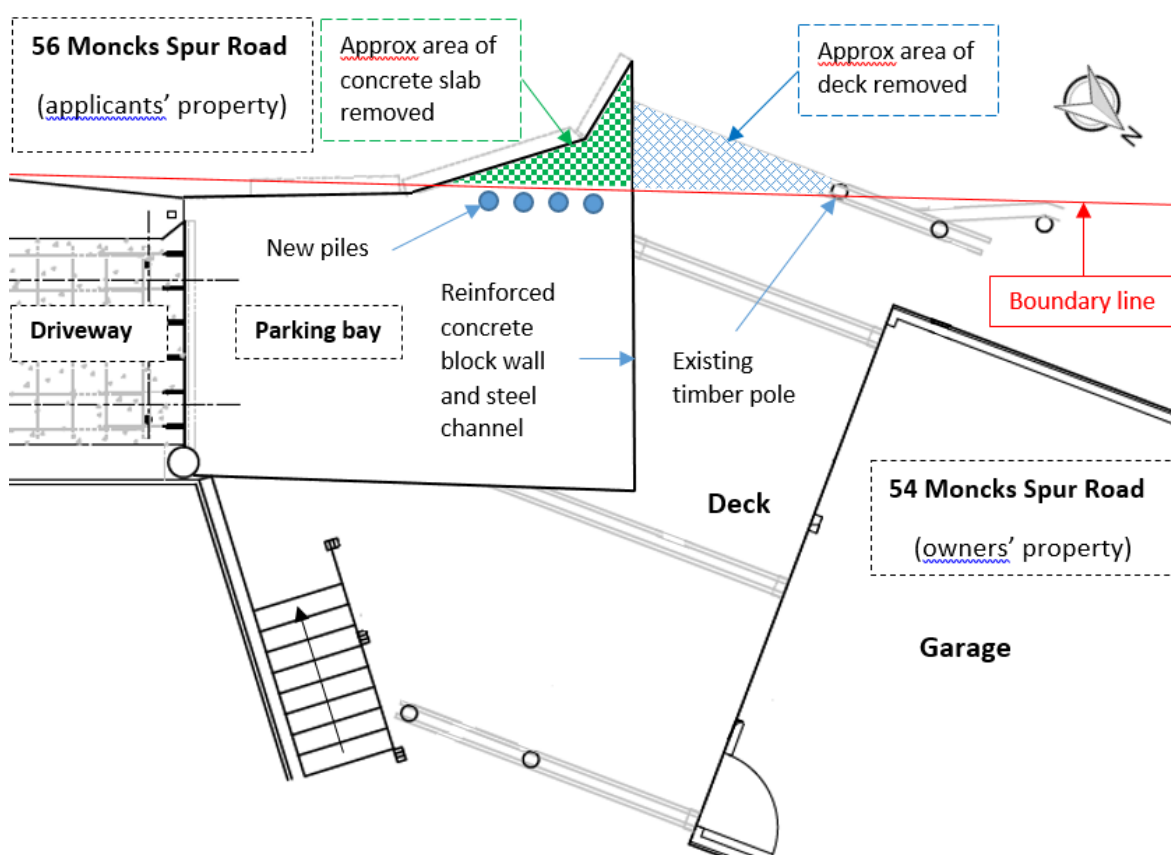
Plan indicating areas of deck and concrete slab removed (not to scale)¹²
